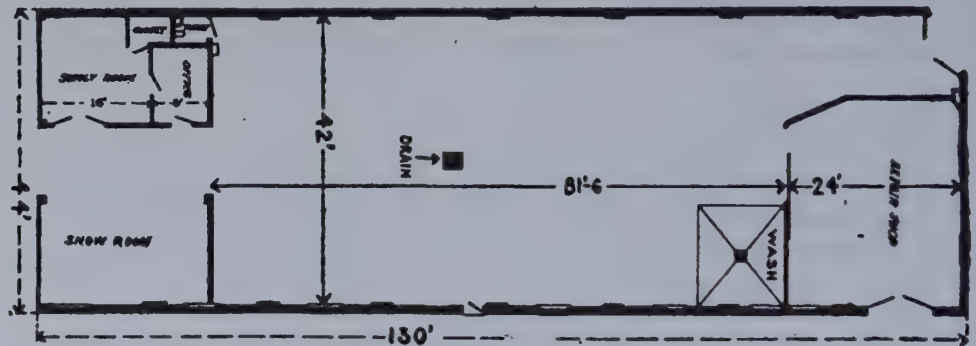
Floor Plan of Garage Suitable for a Small City. The Salesroom, Supply Room, Office, Repair Shop, Garage, Etc., on One Floor.
